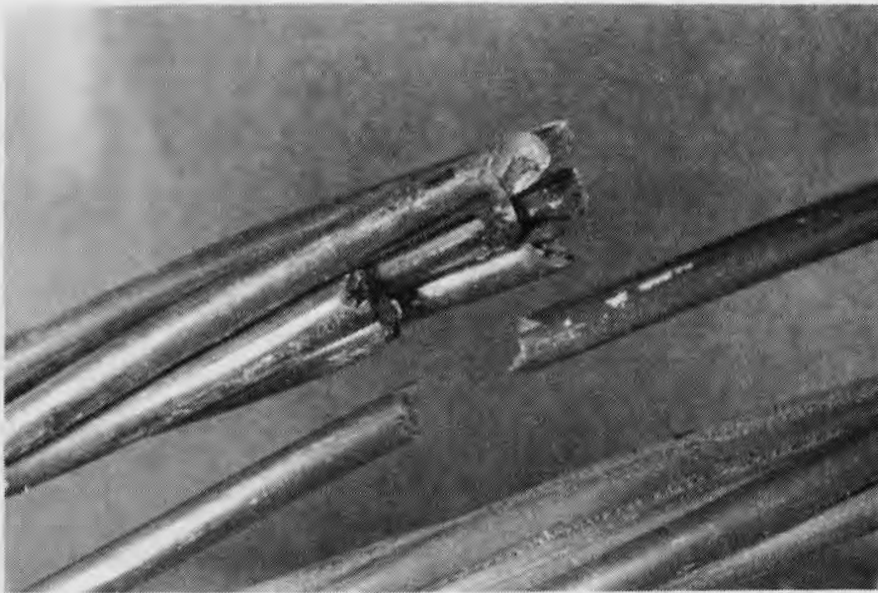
Wire fatigue fractures from beam specimen (upper) and "in-air" specimen (lower)
